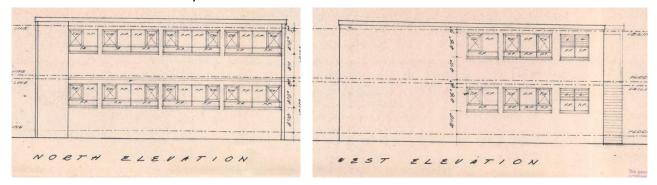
Drawings relating to building permit 57/1612 (K Popper, Oct. 1960). North and west elevations of the proposed new college building. (Source: Council Building File)
